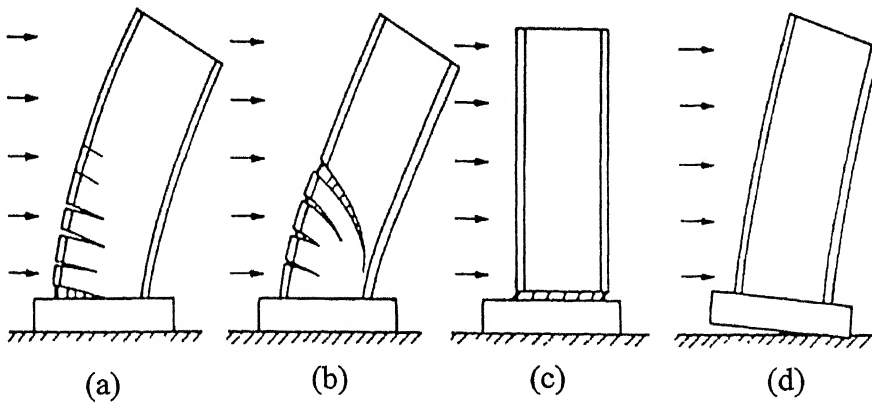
Possible modes of failure of slender walls, (a) flexural failure, (b) flexural-shear failure, (c) sliding failure, and (d) overturning failure [Paulay *et. al.*, 1982].
